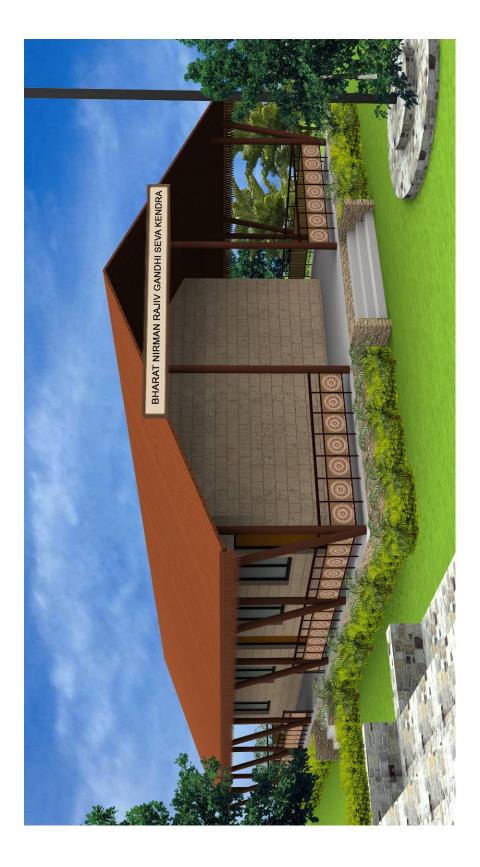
View of Building in Heavy Rain/Snowfall Areas
